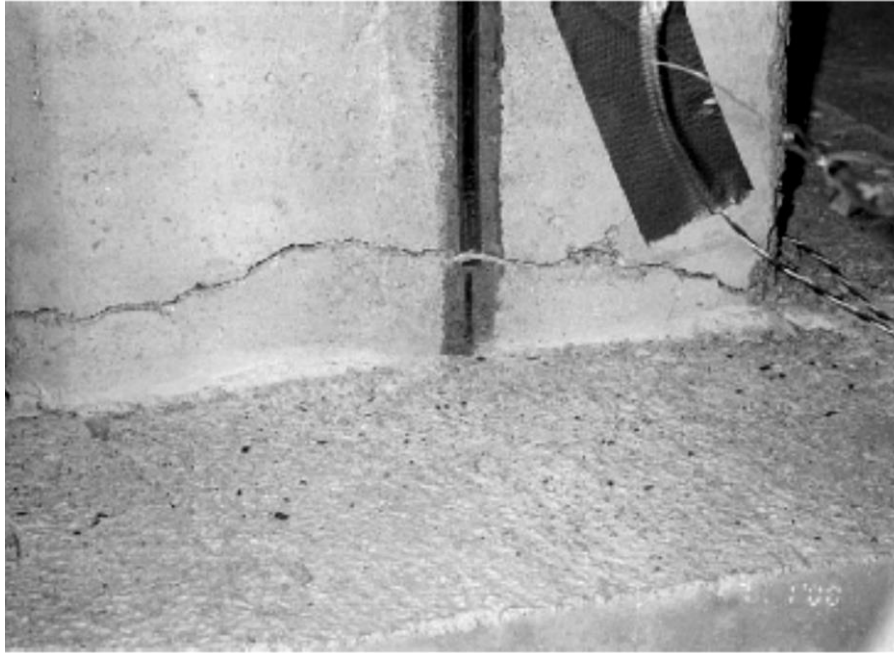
Formation of tension cracks on the precast concrete pile (Arsoy et al 2002)
